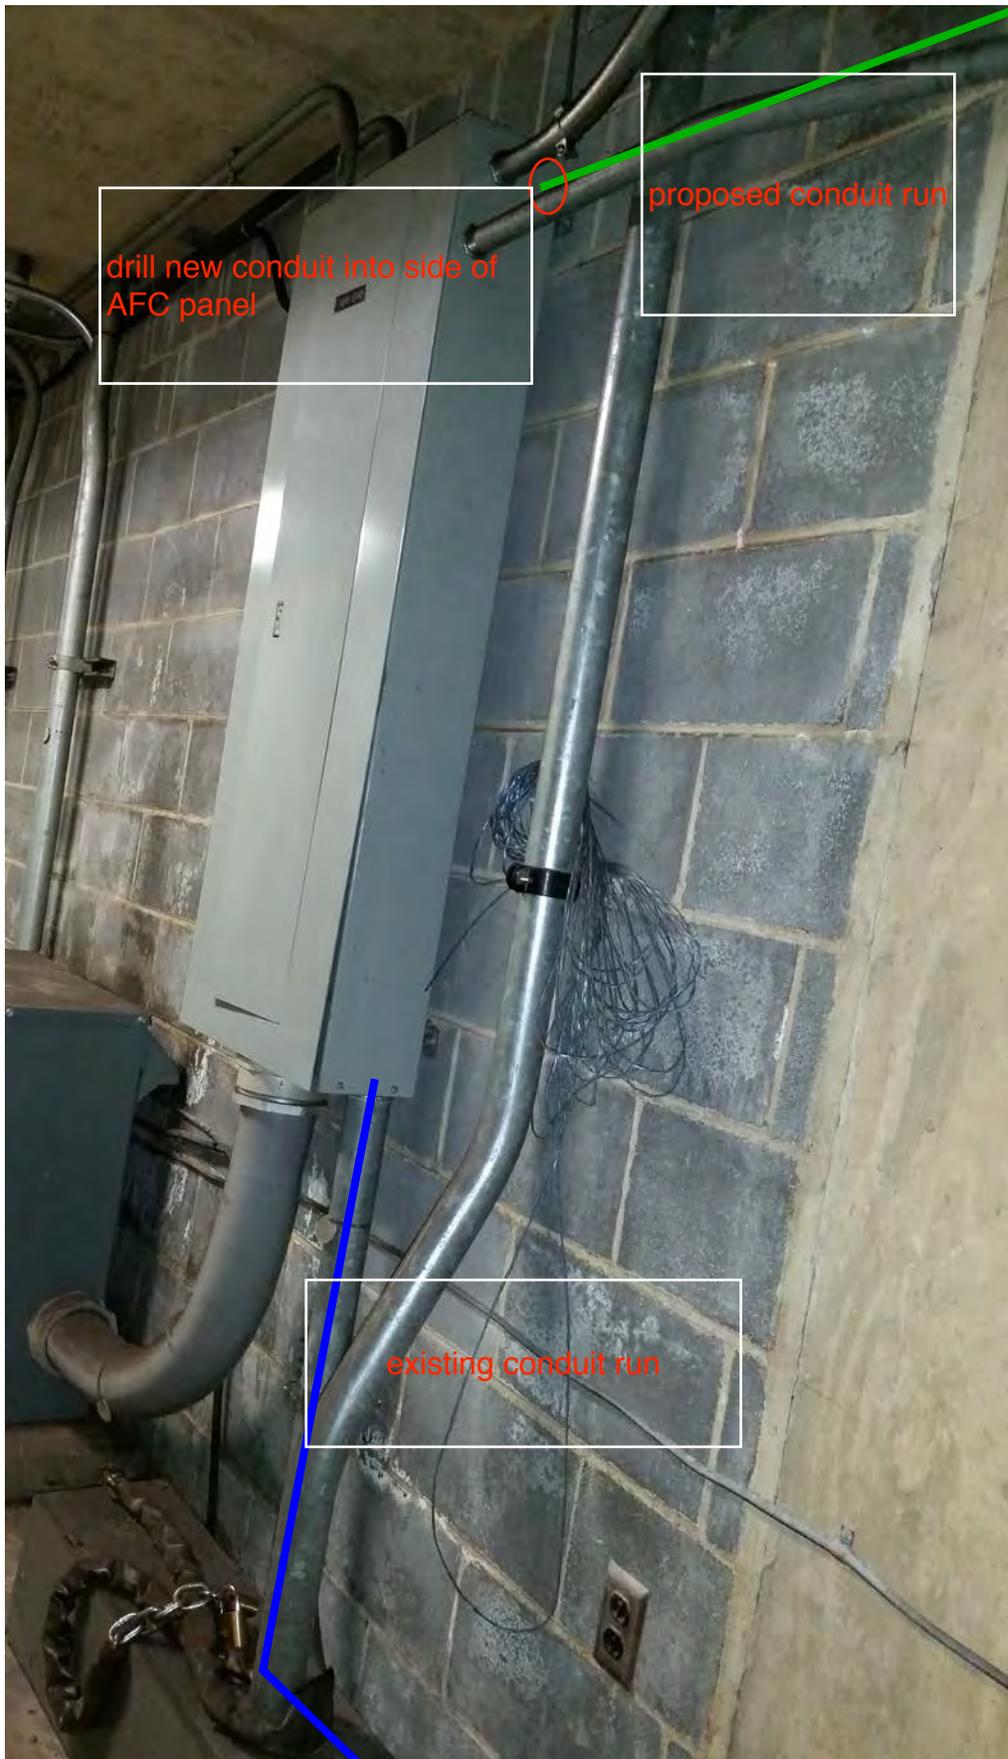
E05 Georgia Avenue: AFC panel with proposed conduit run from handhole 1
